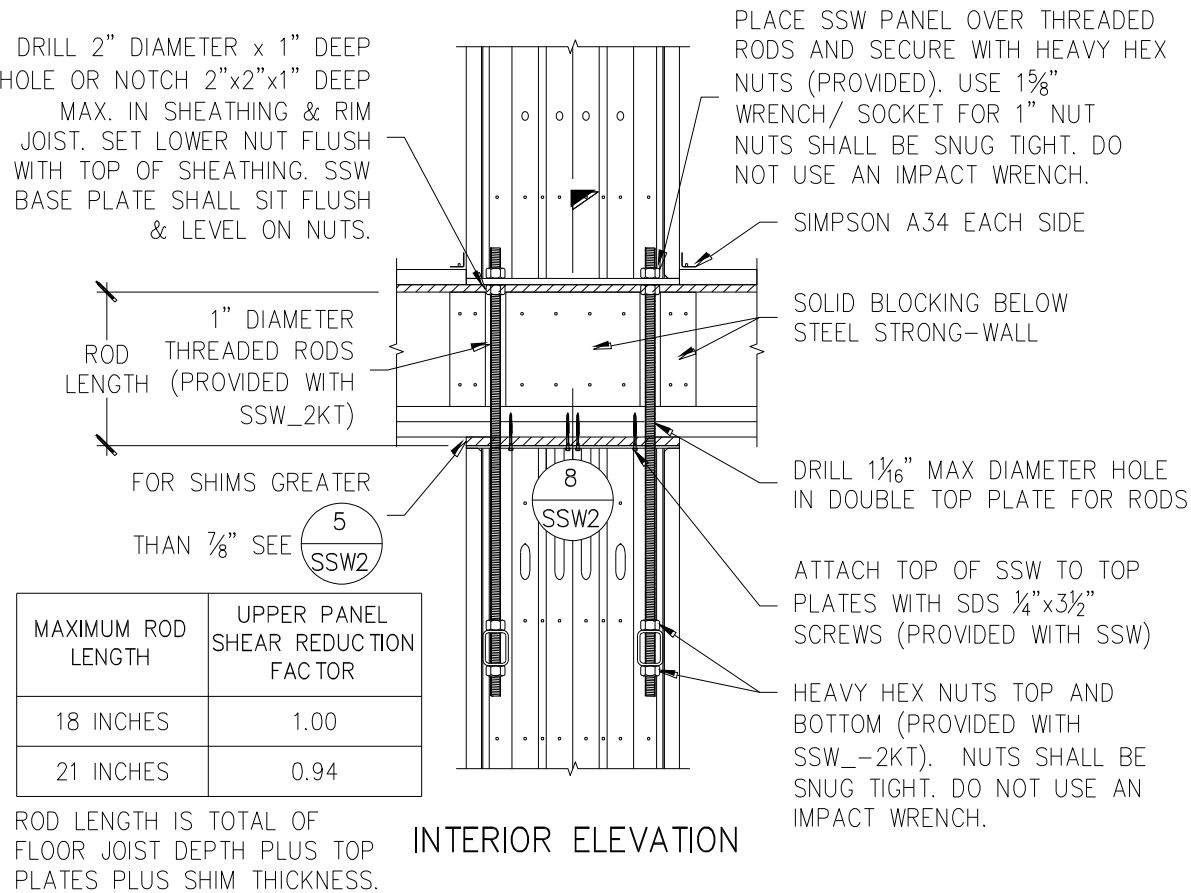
STEEL STRONG-WALL WOOD FLOOR DETAILS (Continued) (7/SSW2)
